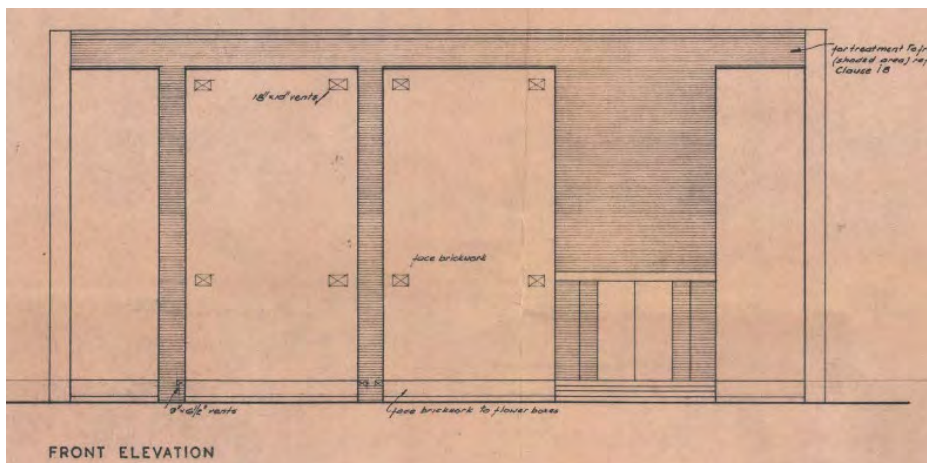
Drawing related to building permit 4609. Proposed front elevation (K Popper, Nov. 1972) (Source: Council Building File)
